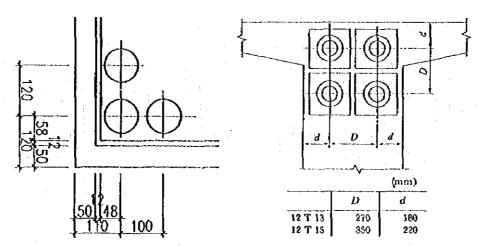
Minimum Cover and Space for PC Tendons of Post-tensioned Beam
